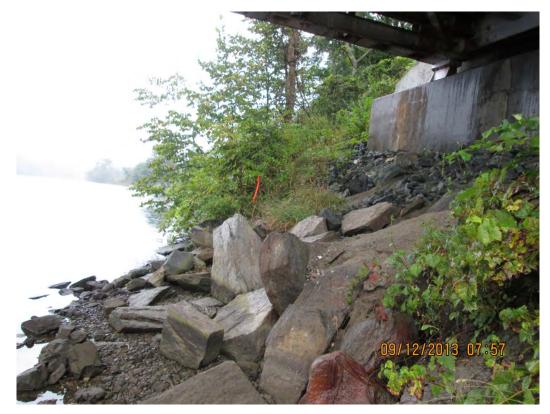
View from NH shoreline looking northerly at existing river, river bank and bridge abutment to be temporary impacted during reconstruction.
